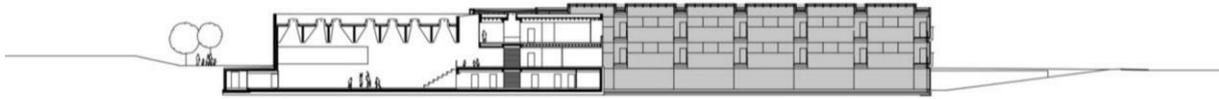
Section of the whole building. From (Archdaily, 2016)
